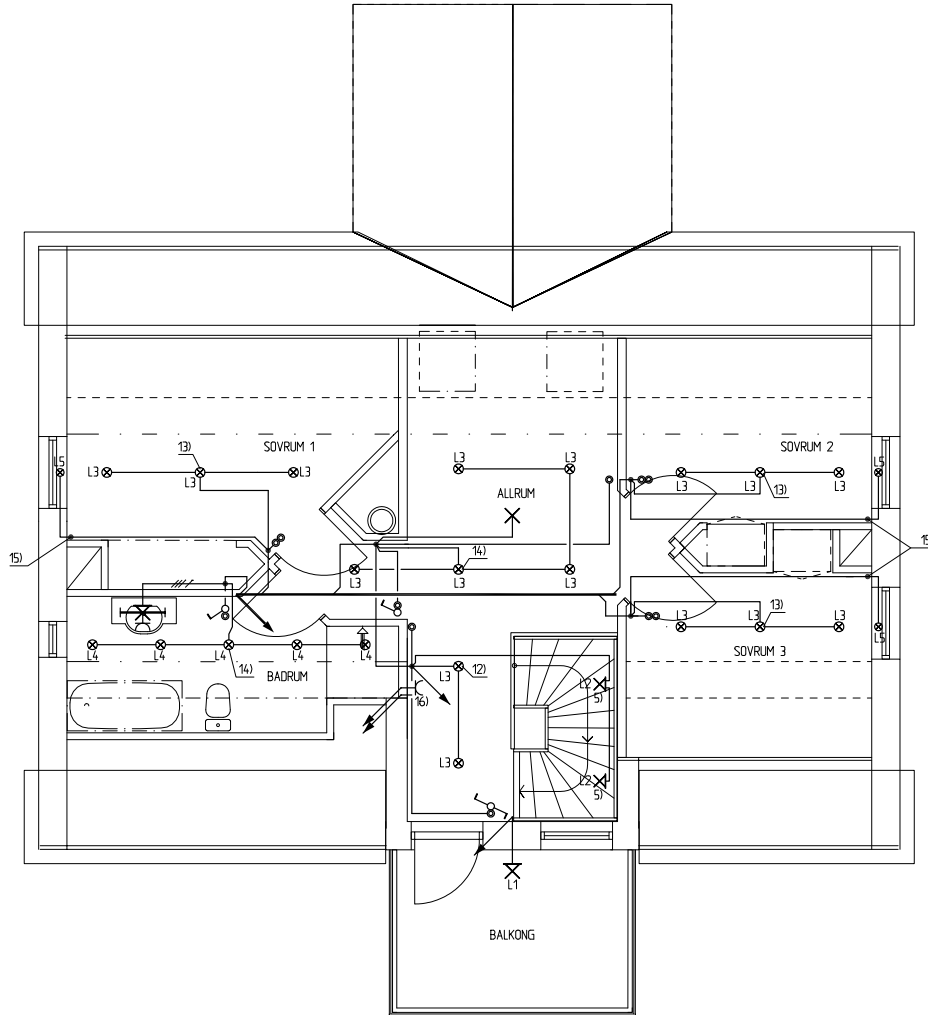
Lighting layout on floor 2, where "L3" is an LED light of 7 W.
